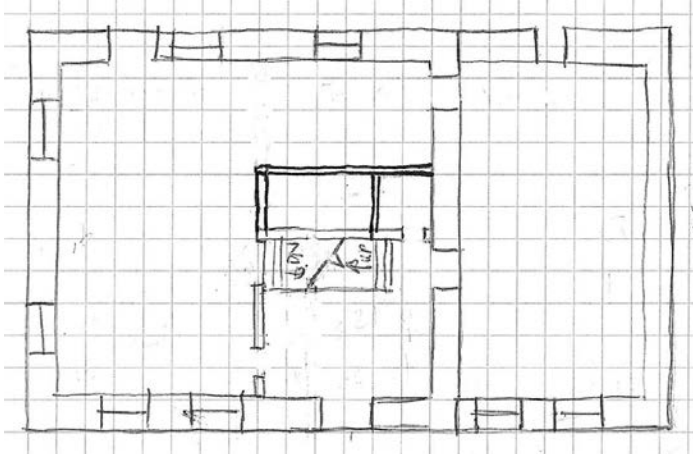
Floorplan of existing floor plan of house. Sketch by Neil Larson, 2018. The store addition is on the right side of the plan connected to the entry lobby through a doorway that possibly had been a window.
